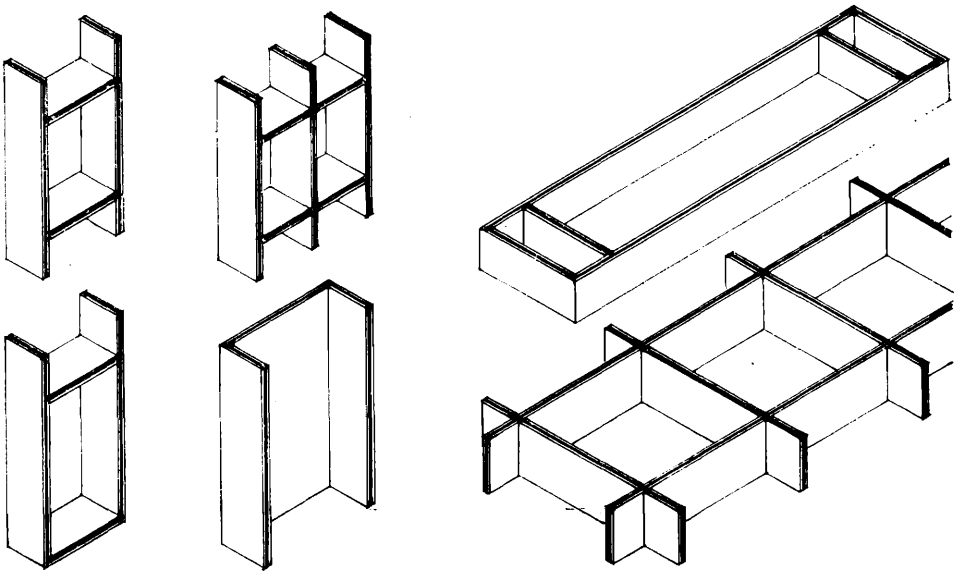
The box-frame as principle of construction.* The box-frame as principle of construction — in general — typically belongs to the small box-unit building methods. The architect here uses factory made stiffened small-box units: box-frames.
